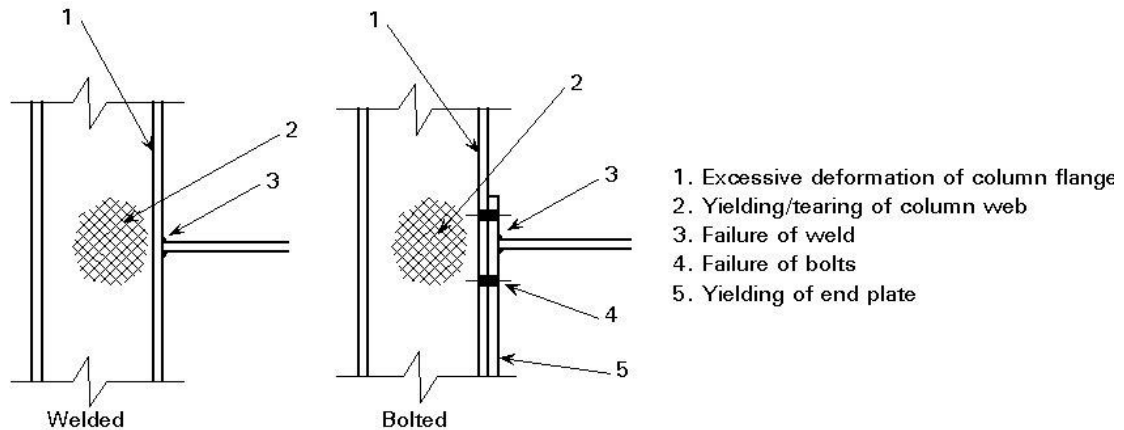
Possible failure modes for the introduction of a tension force in a column web (Case 3 in Figure 9)
